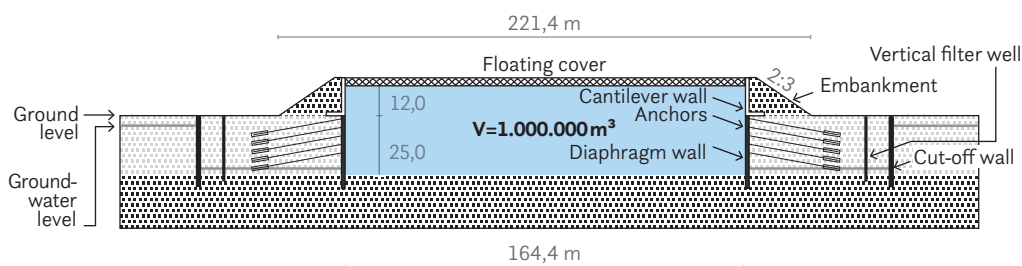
Schematic of a diaphragm wall tank, example of 1,0 Mio m³ (step©)
